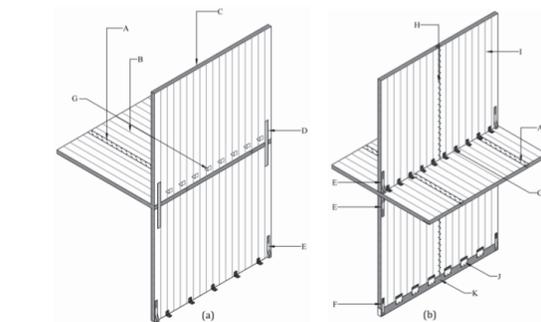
Walls and floors in CLT structures: (a) single-panel and (b) multi-panel [4]
